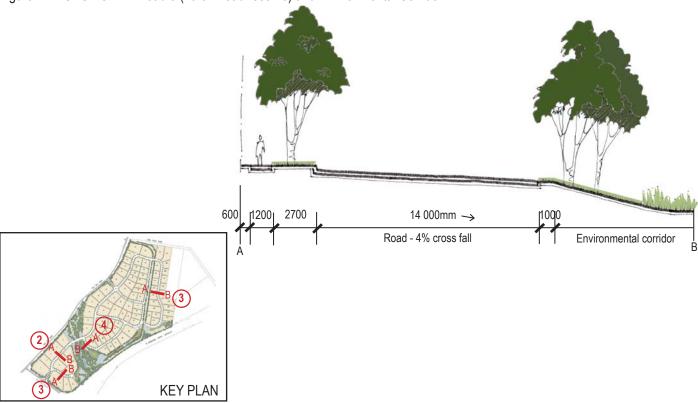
SECTION 5: Road 4 (19.5m road reserve) and Drainage Corridor
